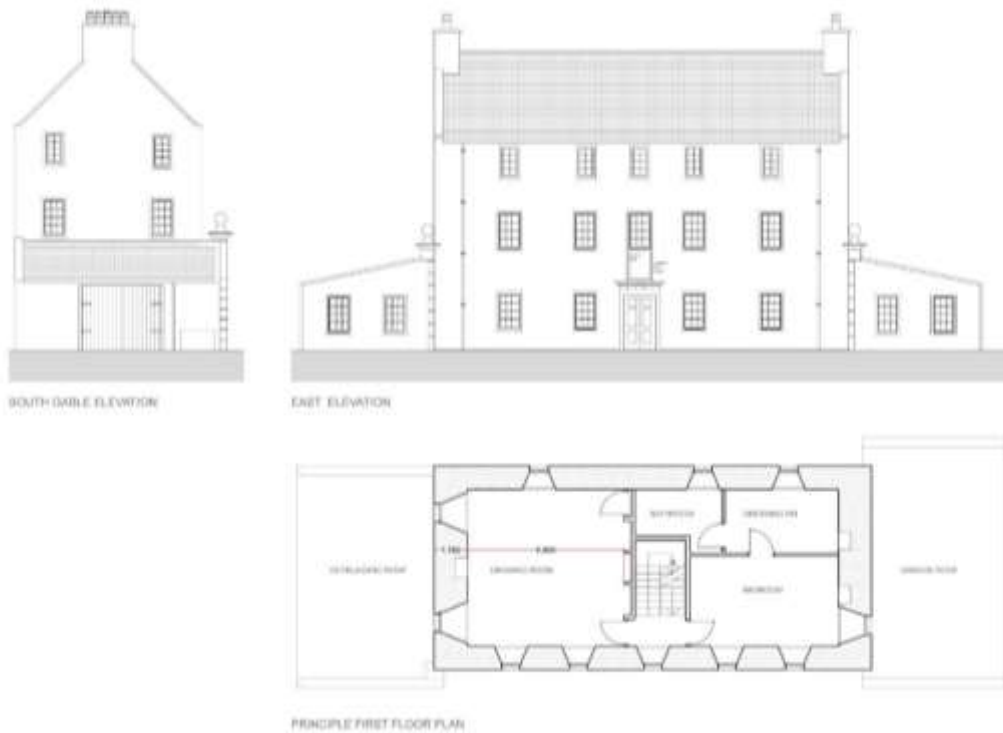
Plan and elevations of Haa of Sand (courtesy of Redman Sutherland Architects).
